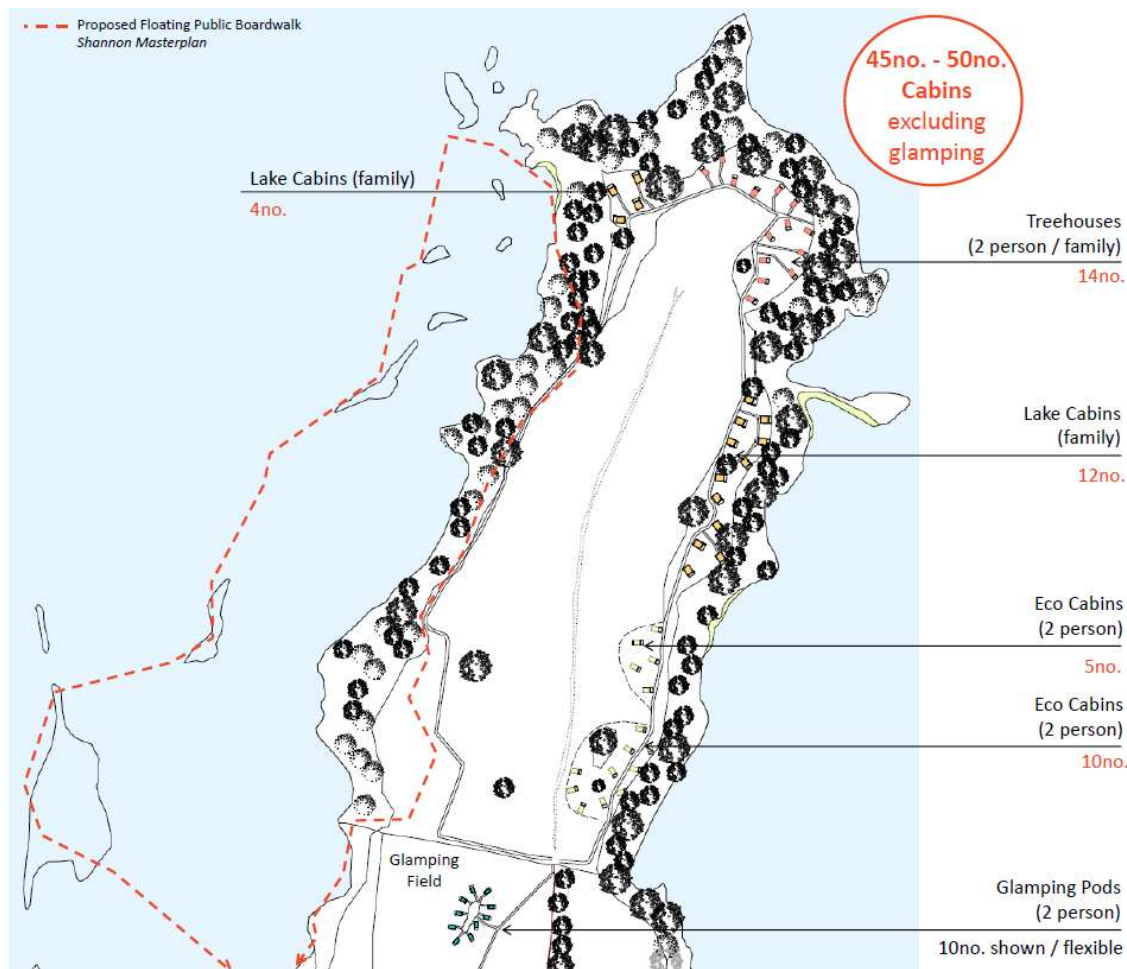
Concept Plan provided by Hodson Bay Hotel Group
